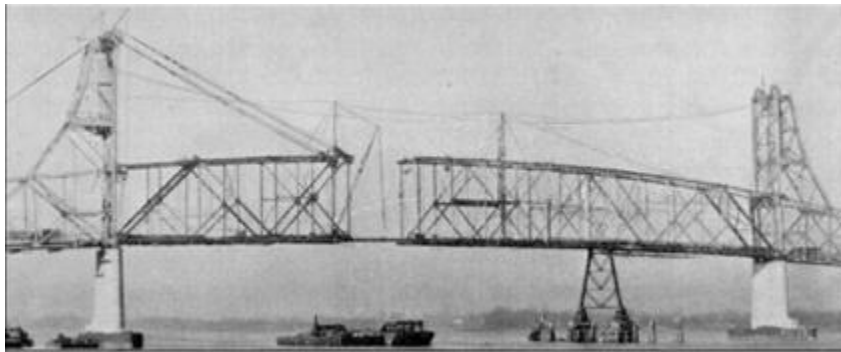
Cantilevered Erection of the Lift Span (www.bcbridges.com)
